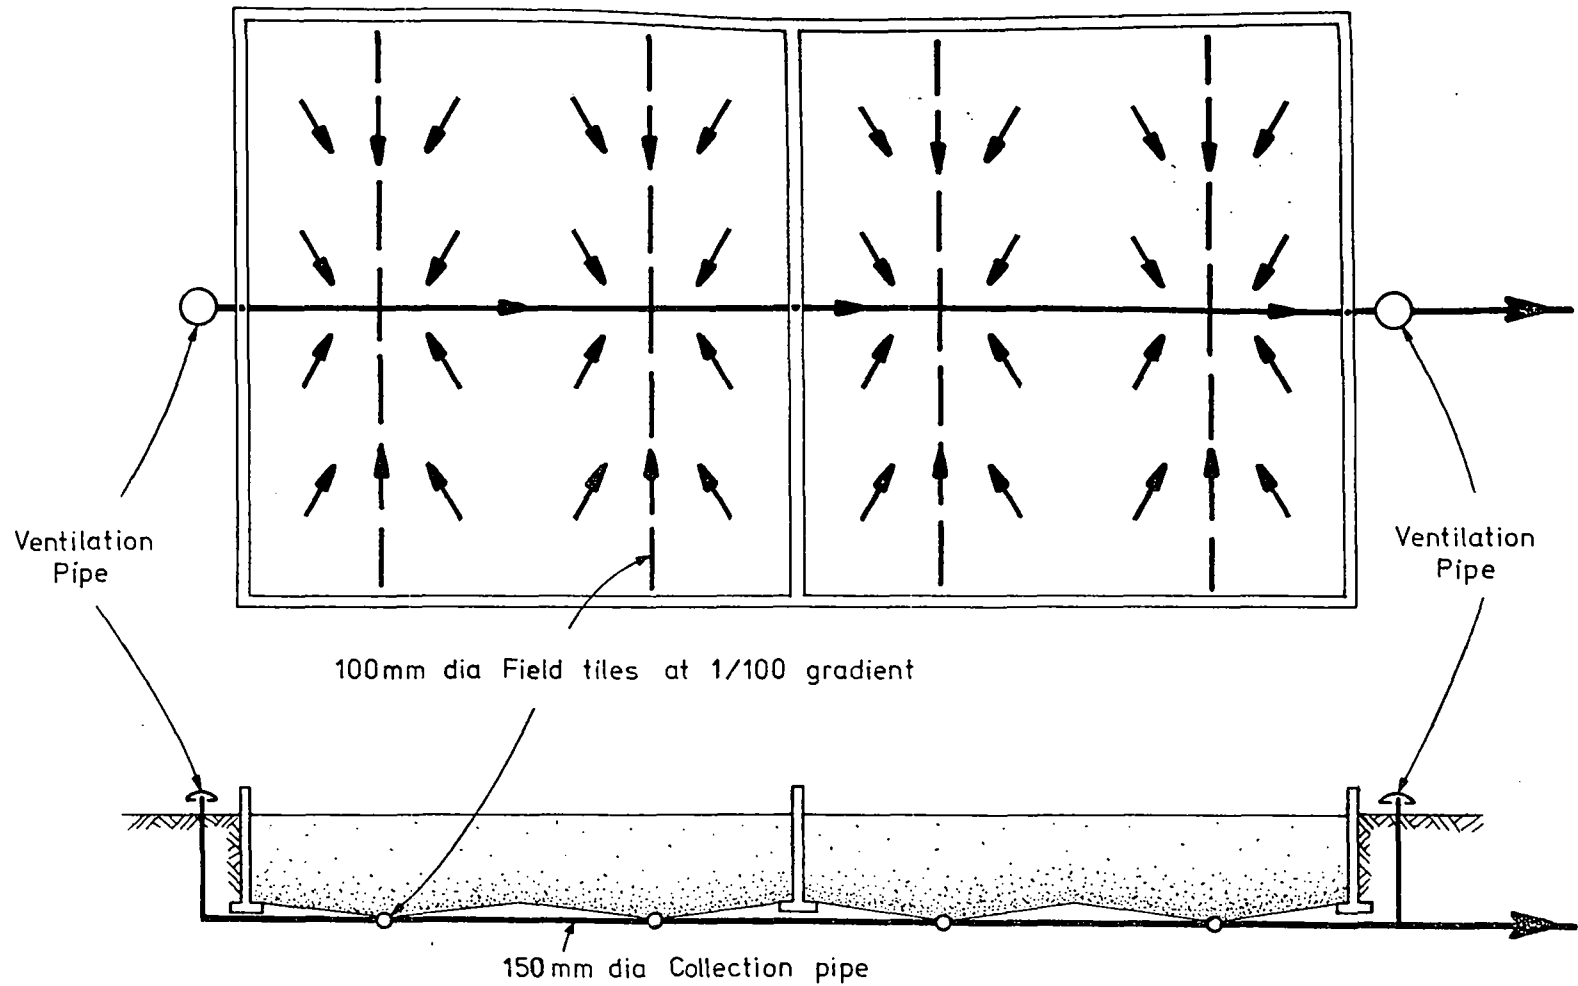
ALTERNATIVE UNDERDRAIN ARRANGEMENT
